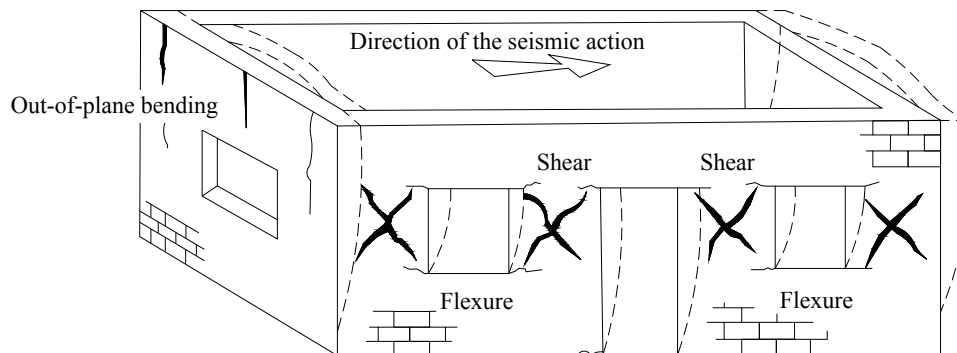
Typical deformation and damage of unreinforced masonry buildings (adapted from Tomažević 1999).
